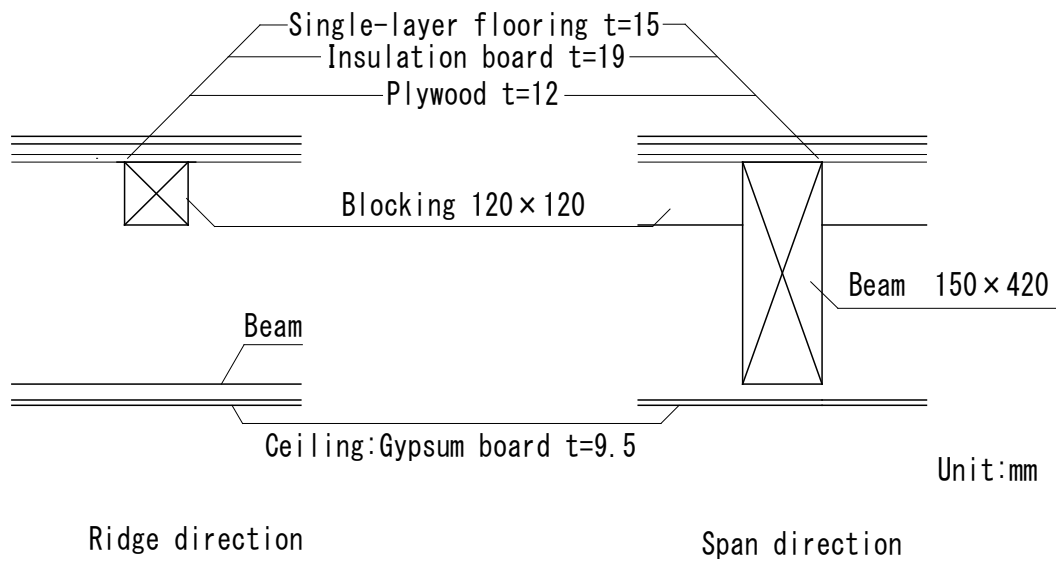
Upstairs floor cross-sectional diagram of elementary school B.
